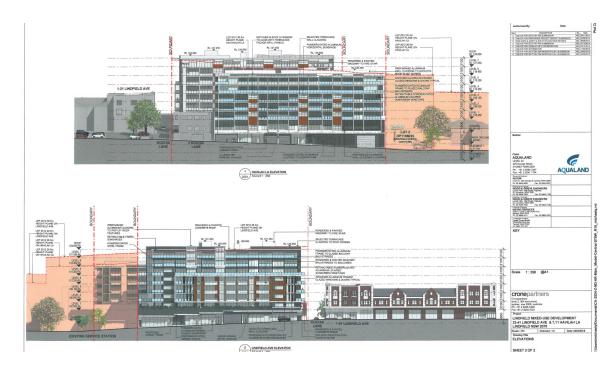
S75W Submission- Mod 3: Havilah Lane and Lindfield Avenue Elevations Source: Crone Partners
